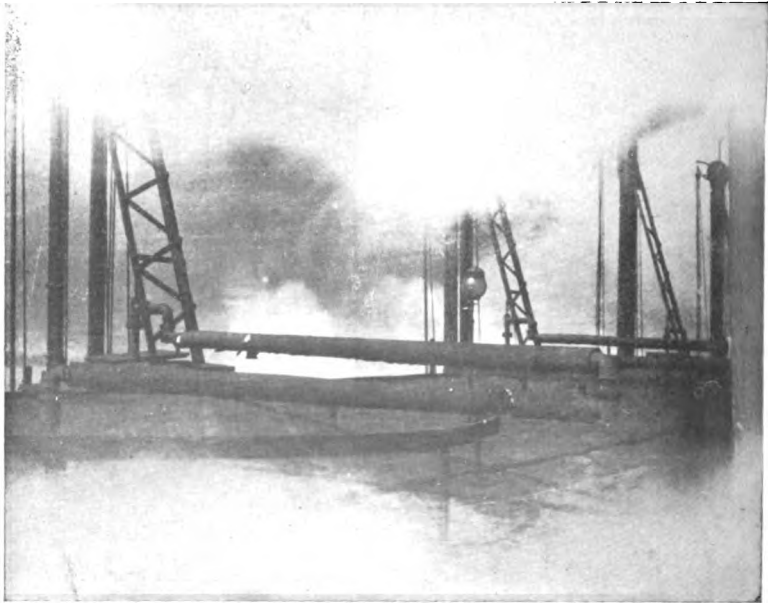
Swing Joints in Supply Pipe: Buffalo Boat No. 5.
